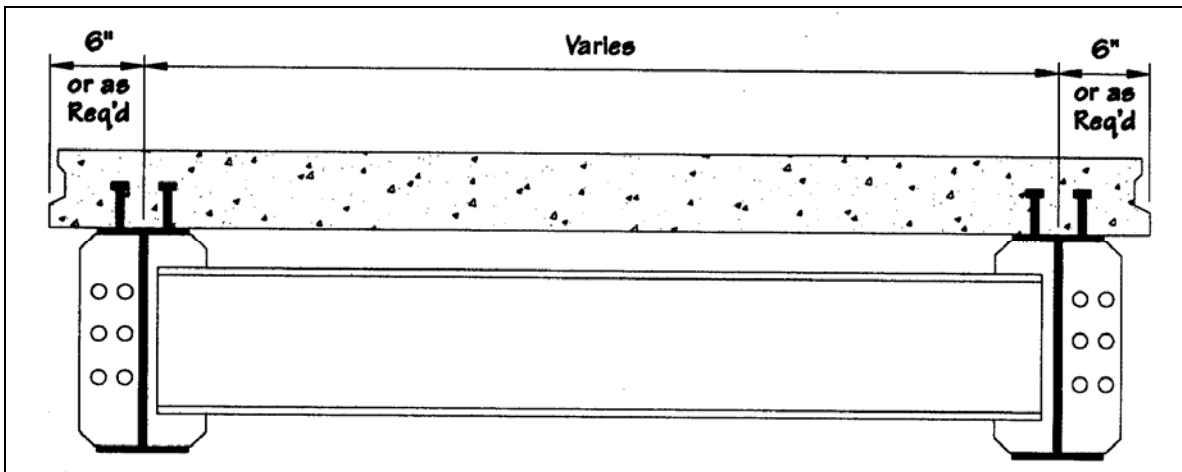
Typical Inverset Bridge System transverse unit cross section (The Fort Miller Co., Inc., 1998)
